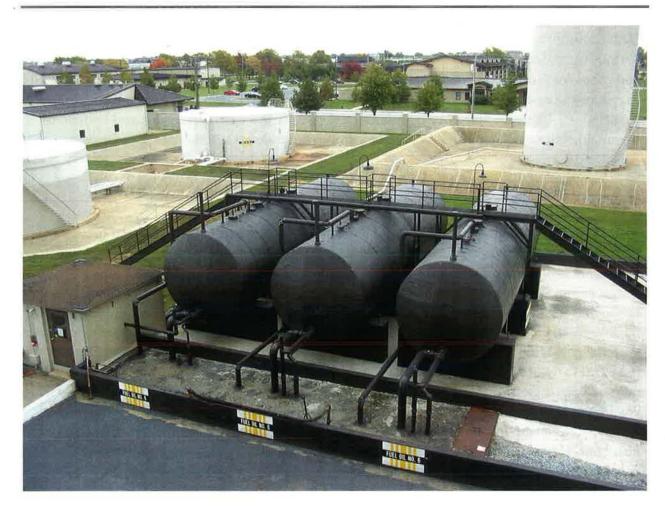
Aboveground Storage Tanks at Central Heat Plant
